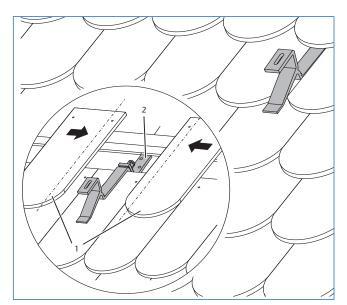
/1 shows the attachment of the roof hook (item 2) to a plain tile cover. Trim and attach the plain tiles on site.
